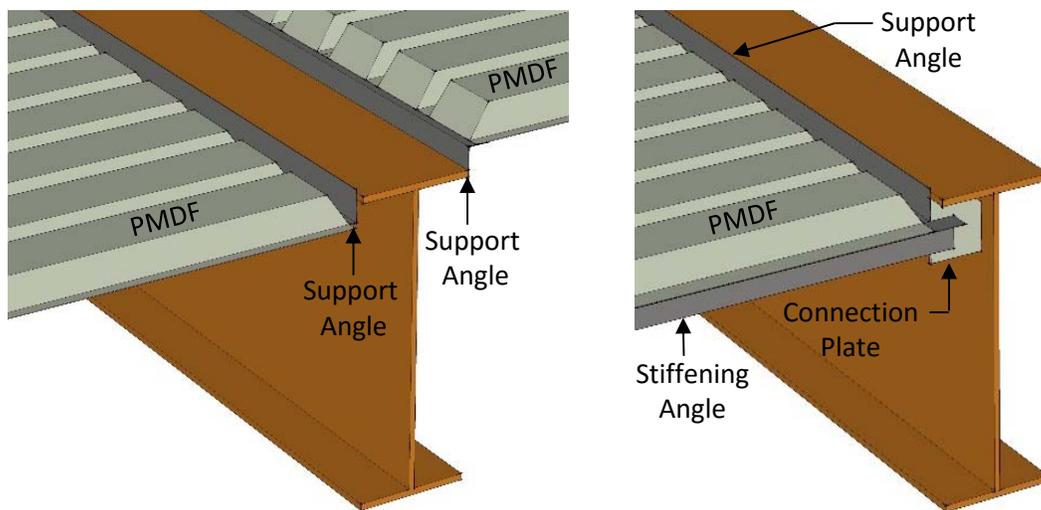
(a) Unstiffened PMDF Connection – Left (b) Stiffened PMDF Connection – Right
